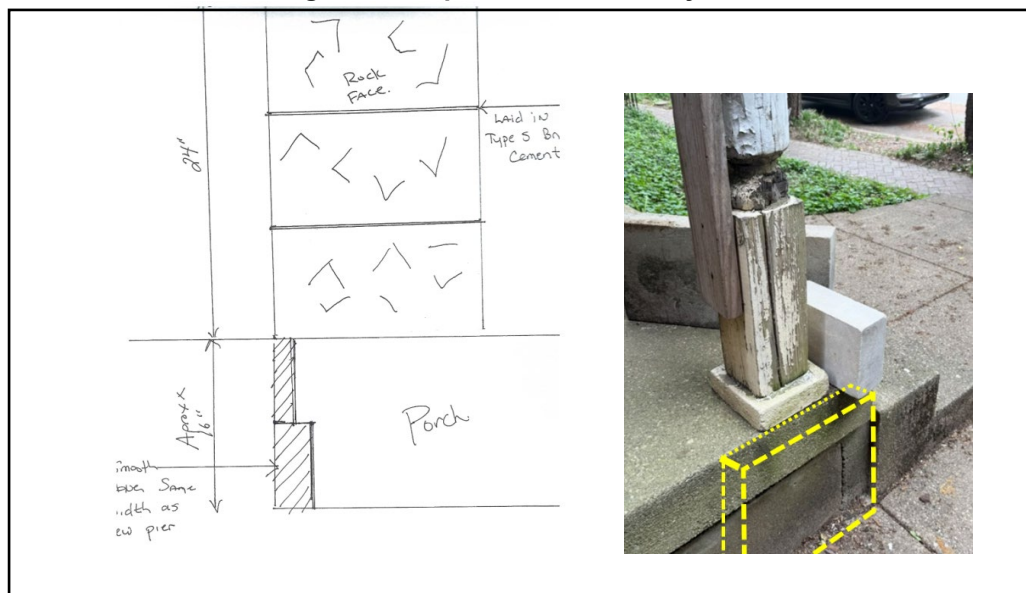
Proposed extension of the porch floor under the new masonry base, shown in yellow.
